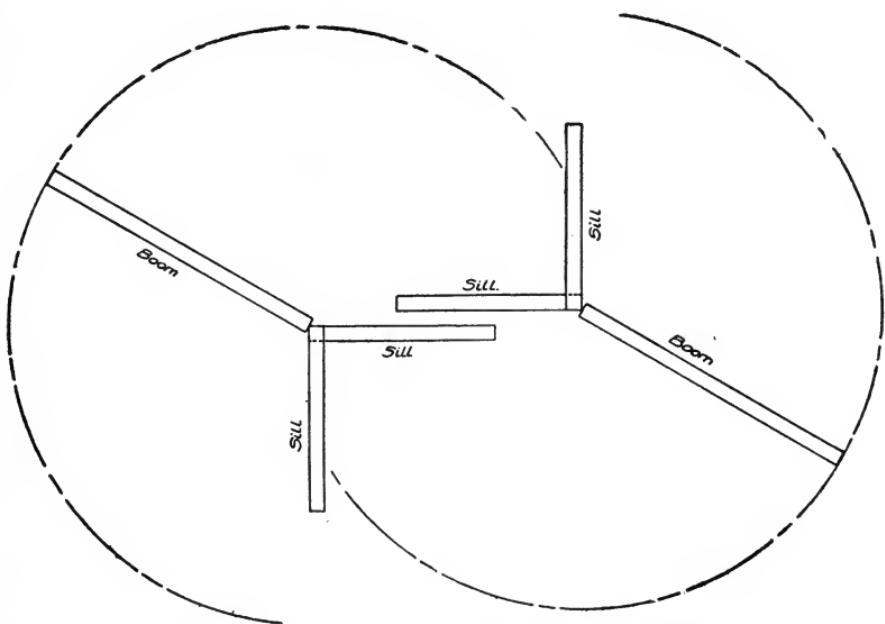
Plan of Layout for Two Stiff-Leg Derricks
